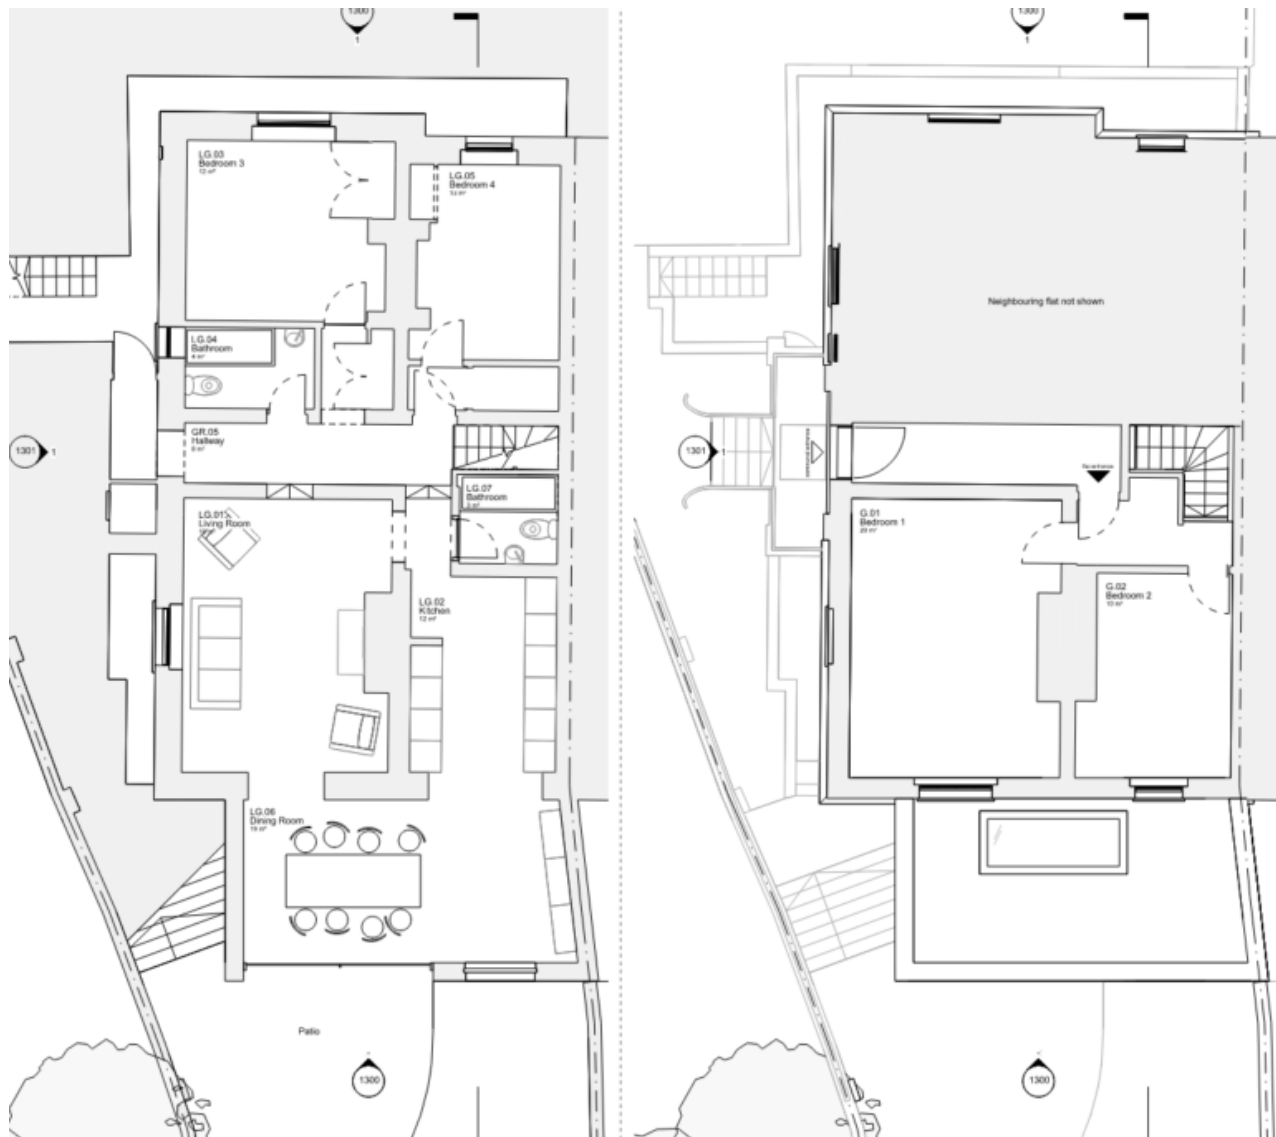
Proposed Lower Ground and Ground Floor plans (Rear extension)
